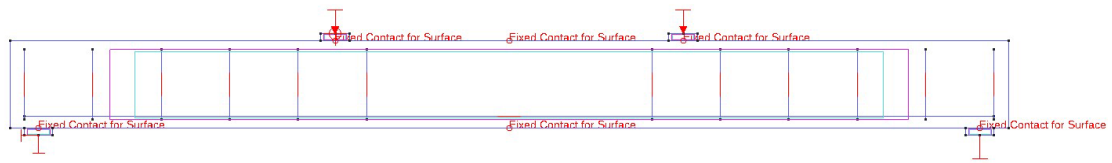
Support conditions and boundary conditions of reinforced concrete beam.
